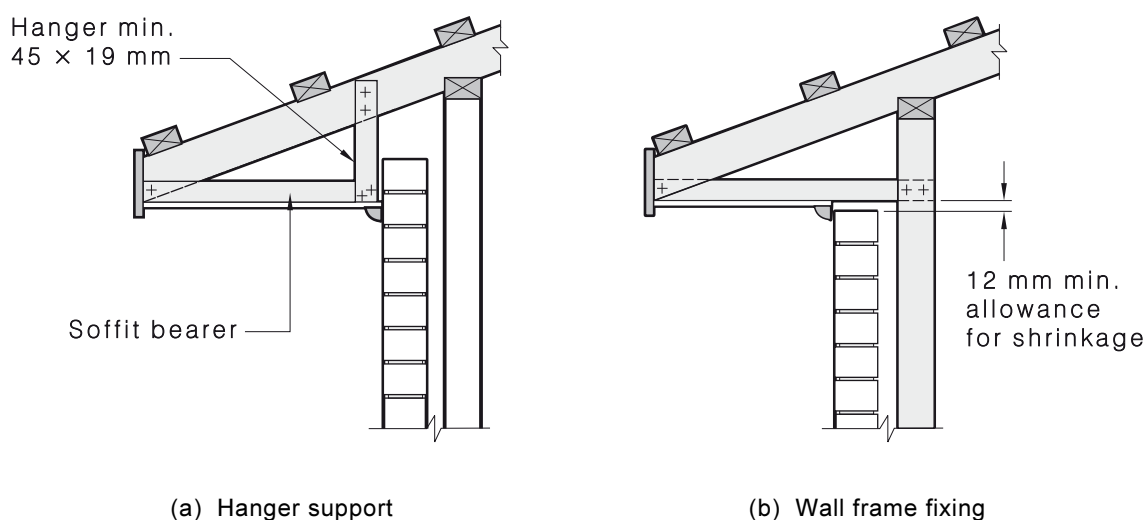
TYPICAL BOXED EAVES CONSTRUCTION
